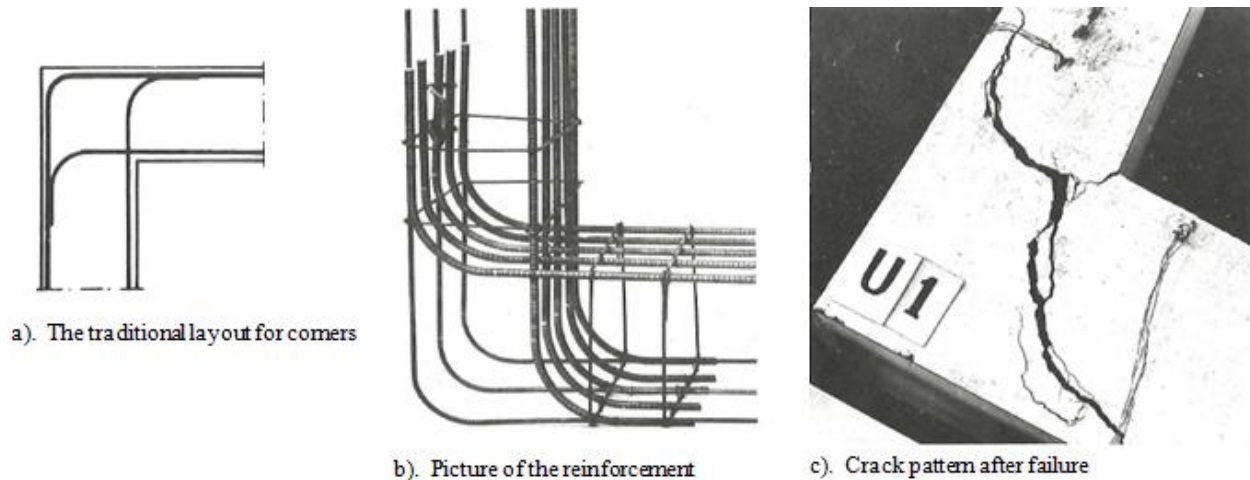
The tradition reinforcement layout (Nilsson, 1973)
